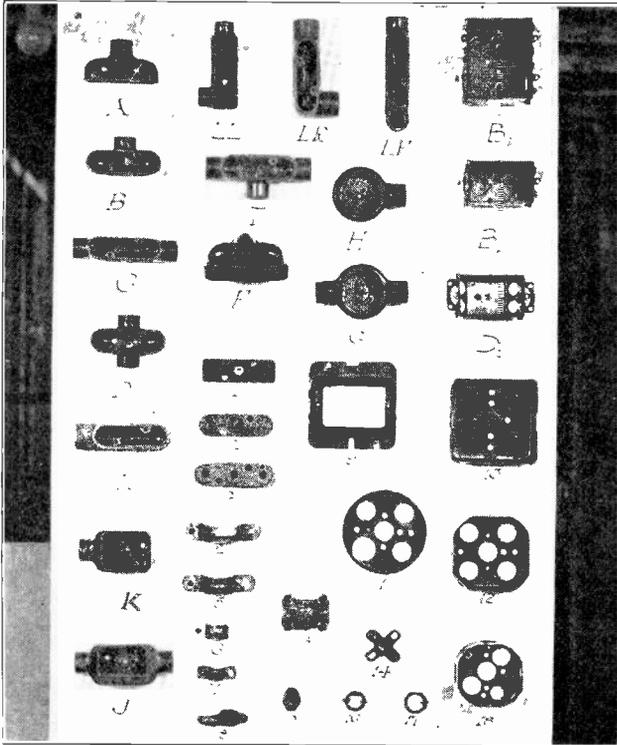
This photo shows a number of the more common types of conduit fittings and outlet boxes, also porcelain covers for the fittings, conduit straps, fixture stud and lock nuts.
